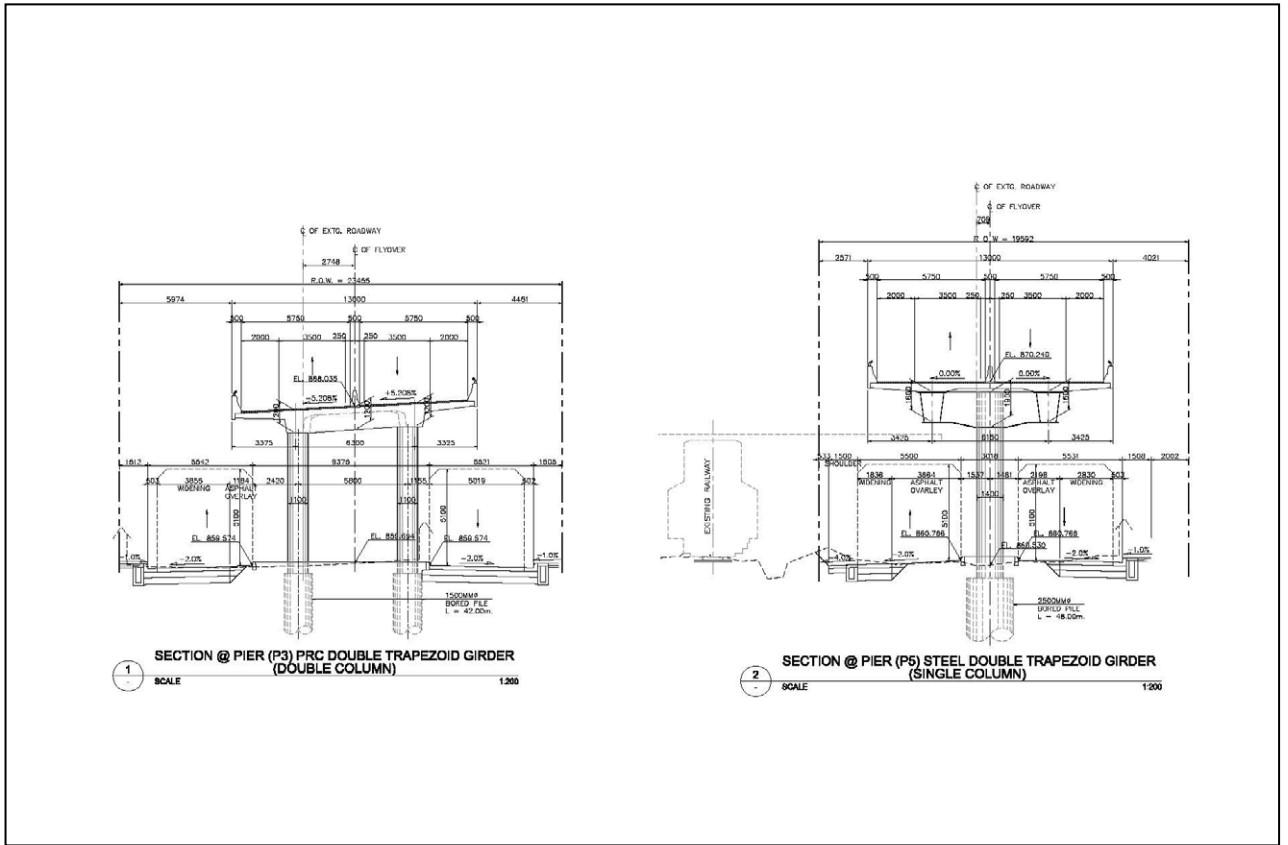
TYPICAL CROSS SECTION (NAGREG)
